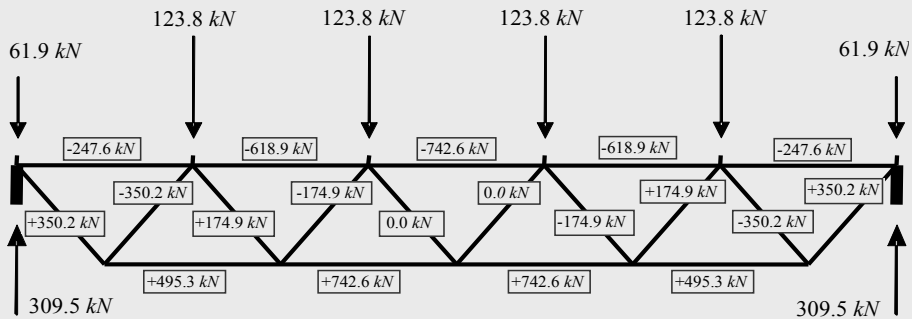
Actions and internal forces on the lattice girder of example 3.3
